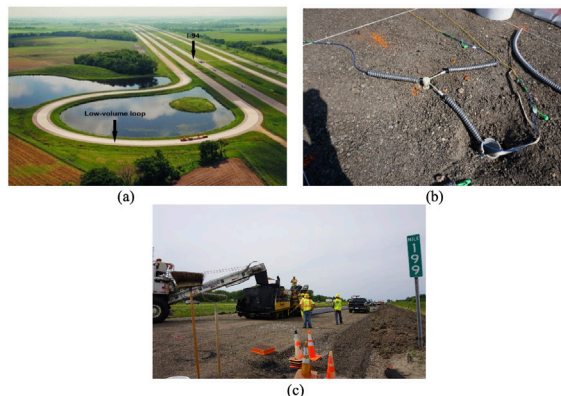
(a) MnROAD Facility, (b) The Sensor Installation Scene, and (c) Installation Scene
